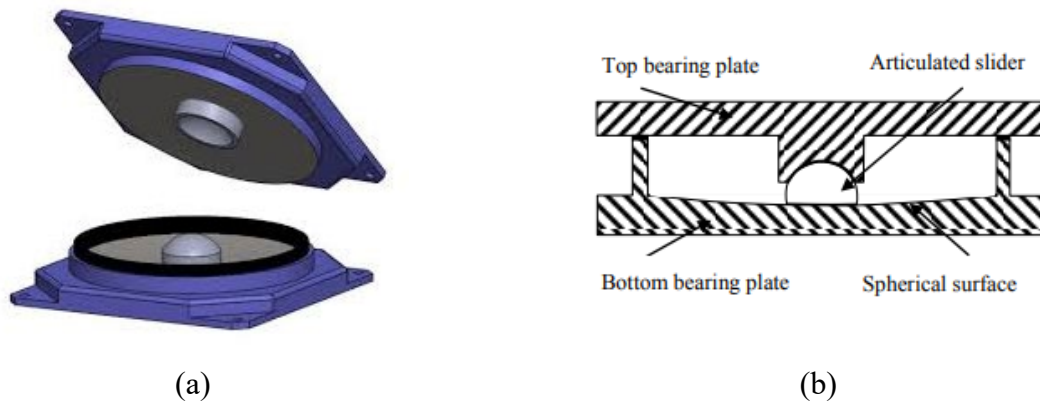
Single pendulum bearing (a) 3D view and (b) Section view (Gillich et al, 2018)
